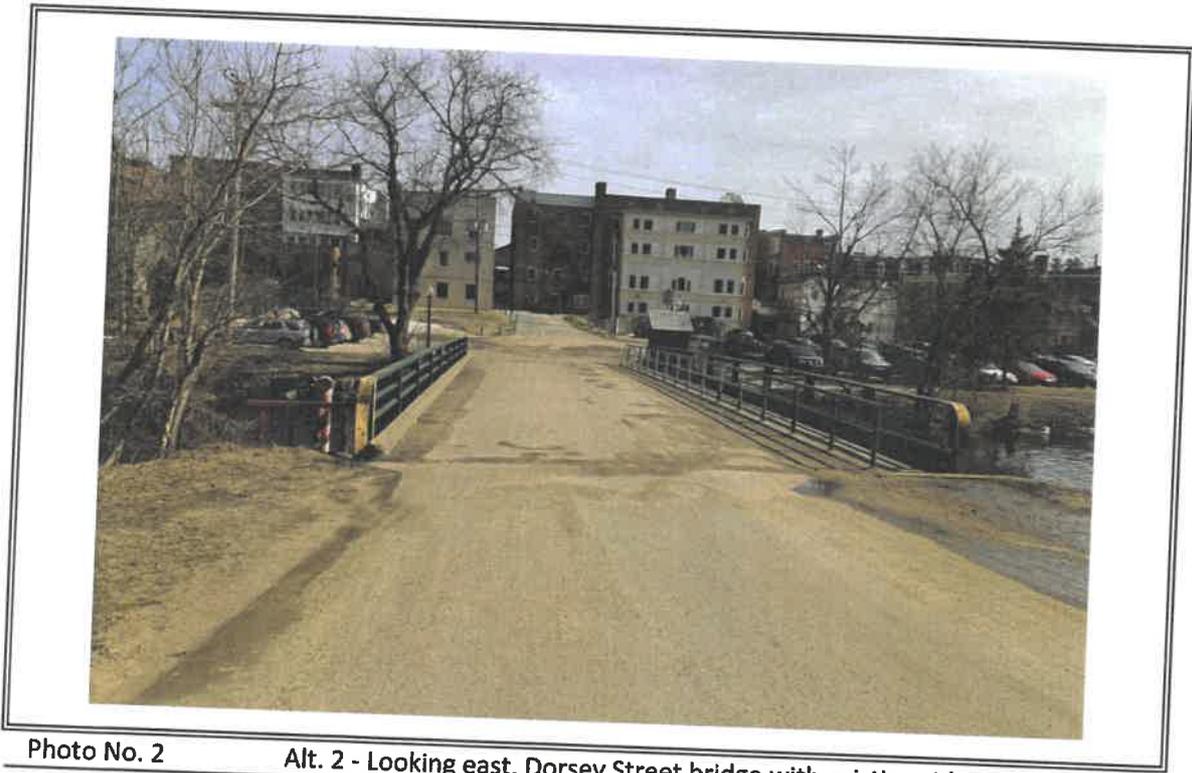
Alt. 2 - Looking east, Dorsey Street bridge with existing sidewalk
